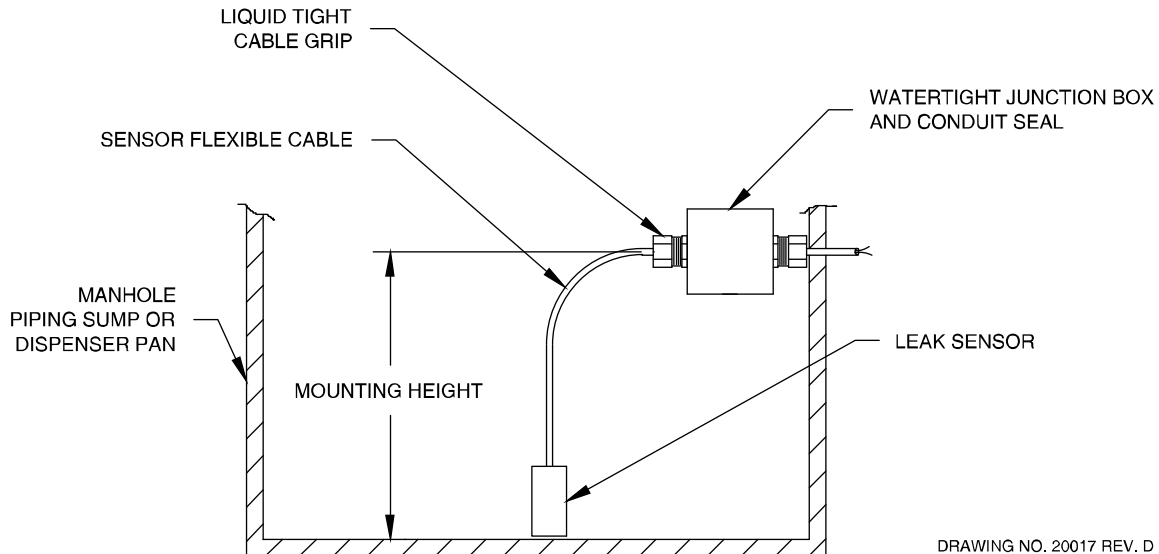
Leak Sensor Installation in Piping Sumps, Manholes, and Dispenser Pans
